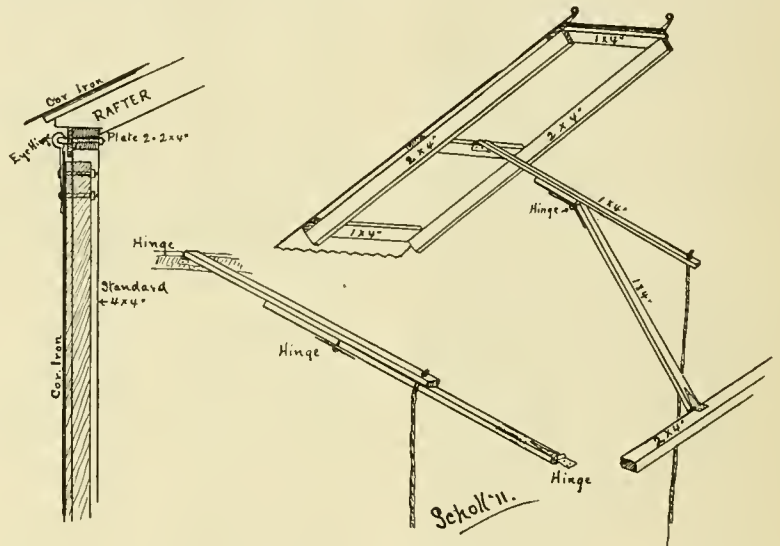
DETAIL OF SHUTTER-CONSTRUCTION.
